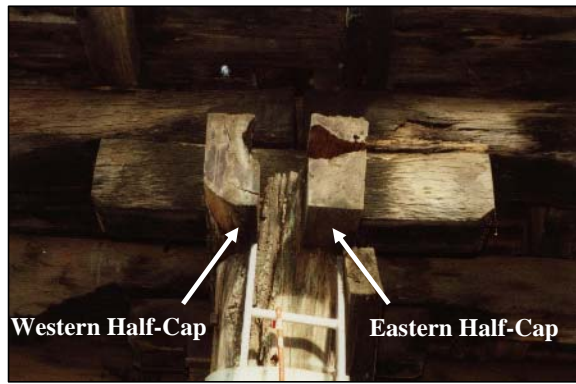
Termite damage to half-caps above pile 1 on pier 22.
